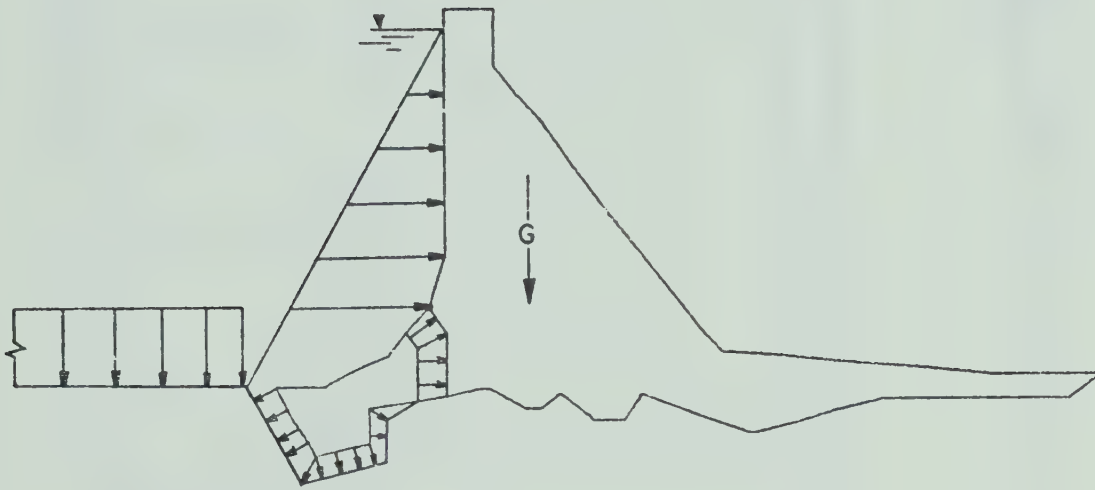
LOADING CONDITIONS ON THE DAM AND FOUNDATION AFTER SEPARATION OF THE STRUT
